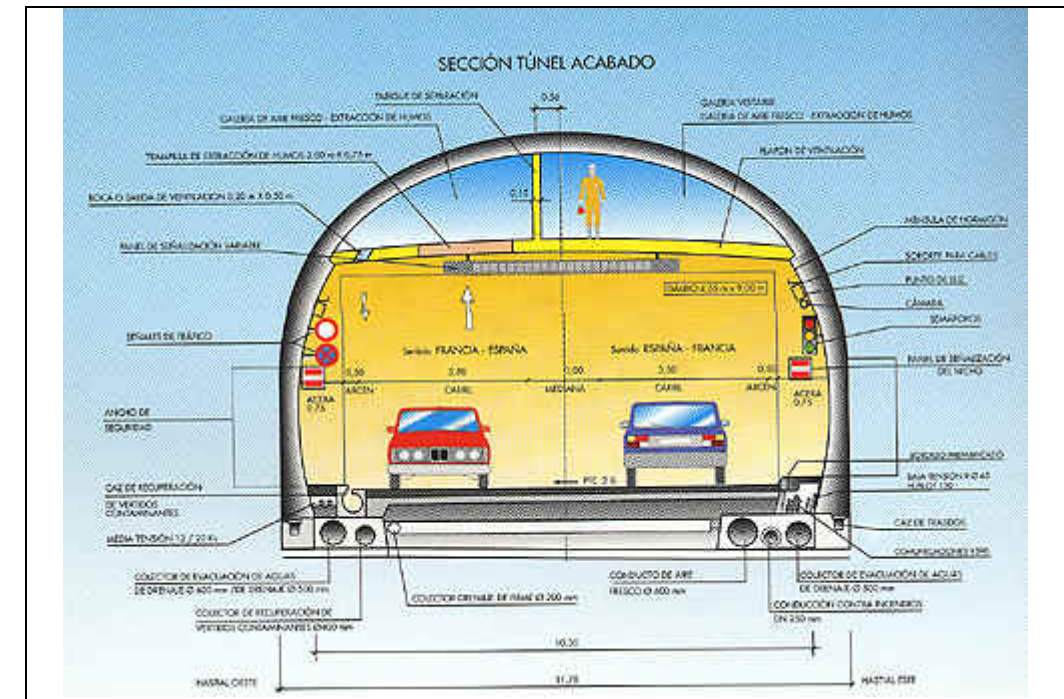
Section of the new Somport road tunnel, with different roof ducts.
